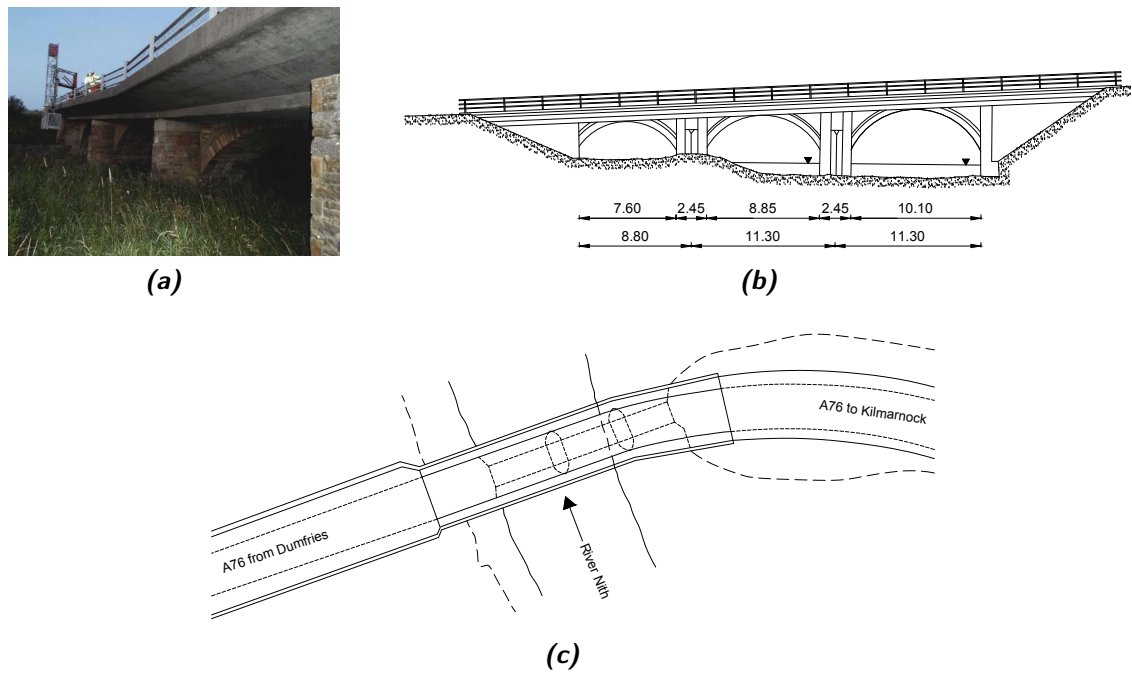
(a) A76 120 Guildhall bridge, (b) bridge elevation and (c) and plan view
